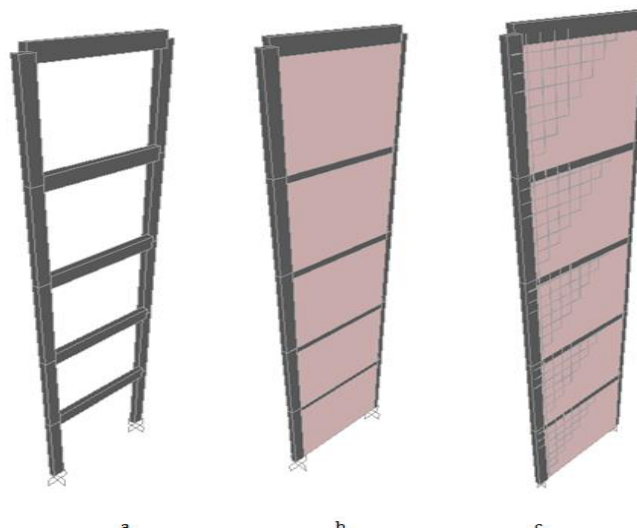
showing typical models for 4m, 5m, and 6m 1bay 5storey frames
